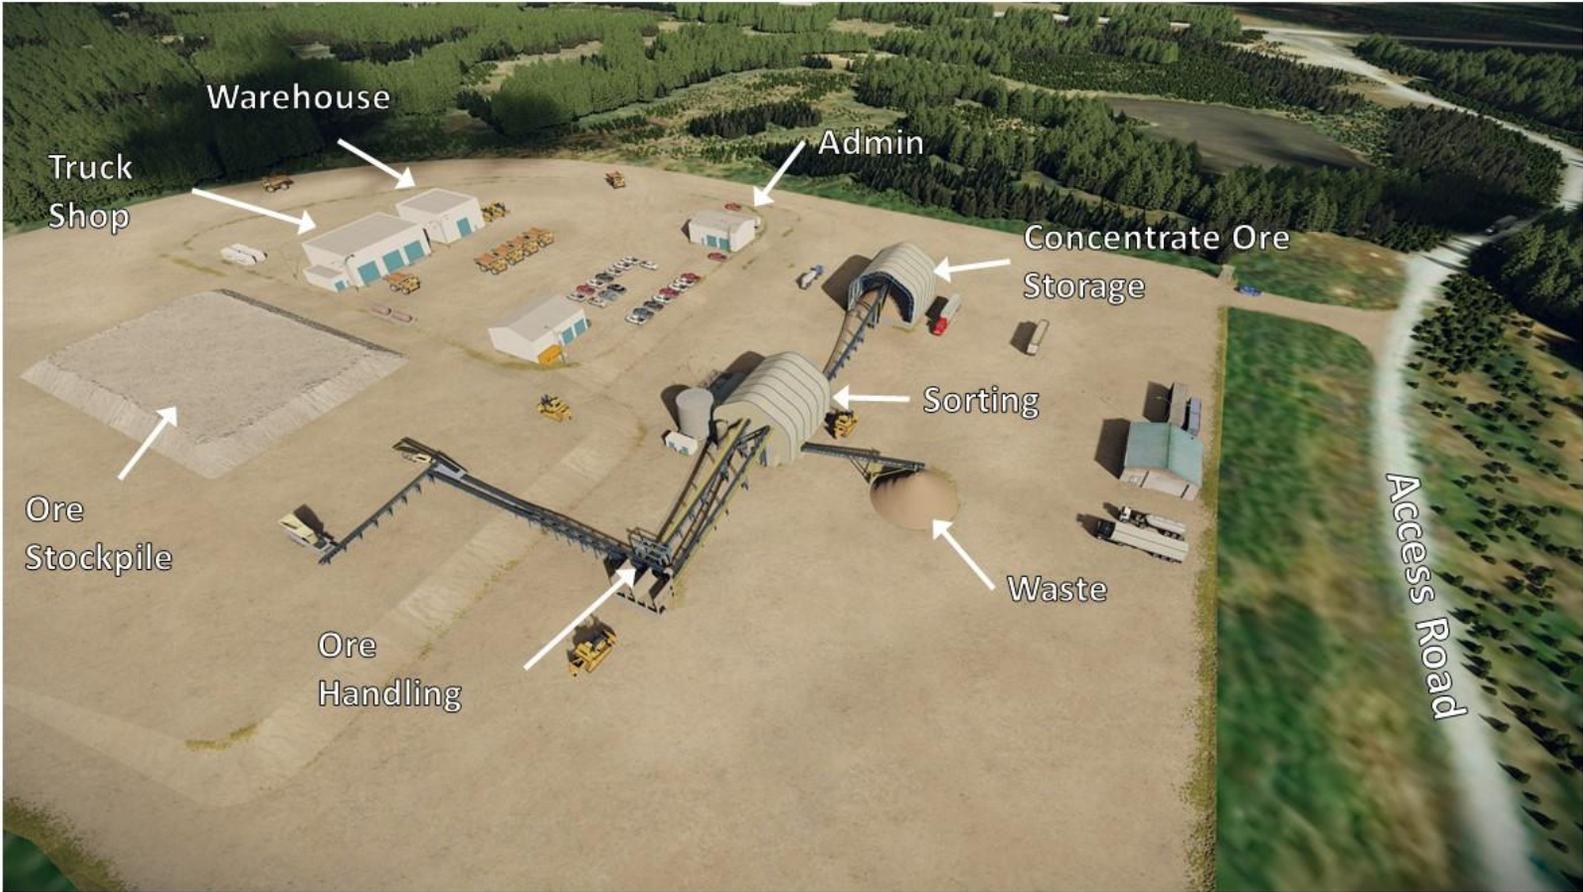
Conceptual Rendering of the Crushing and Sorting Plant Site Area
